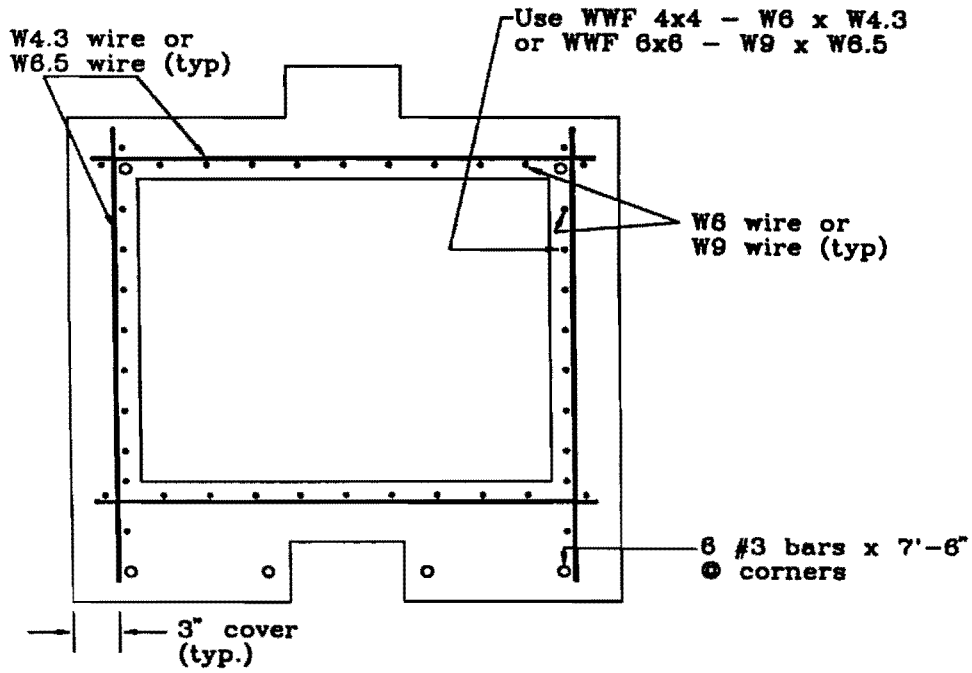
Eco-Bloc Reinforcing Using Welded Wire Fabric (11)
